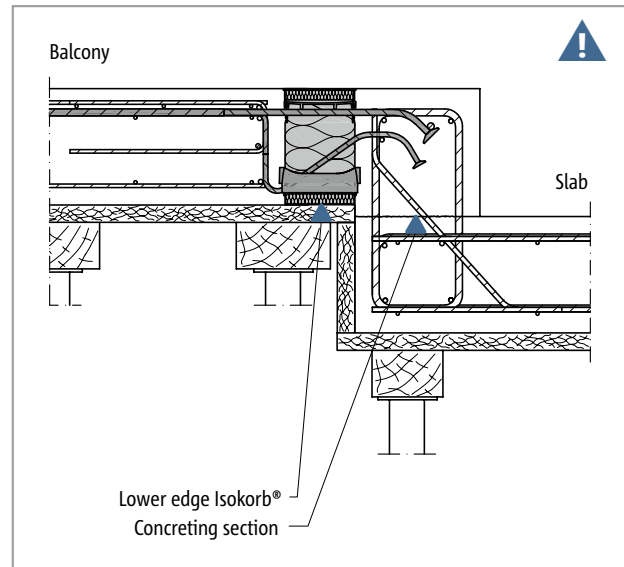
Schöck Isokorb® XT type K-O: In-situ concrete balcony with height offset upwards
